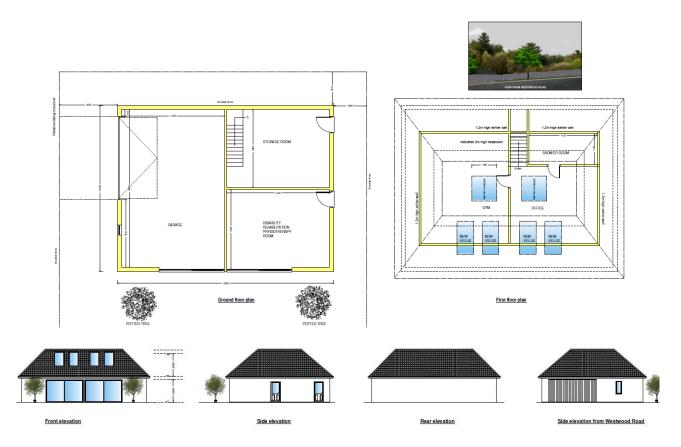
Floor plans and elevations of approved scheme planning permission 21/04175/HSE
